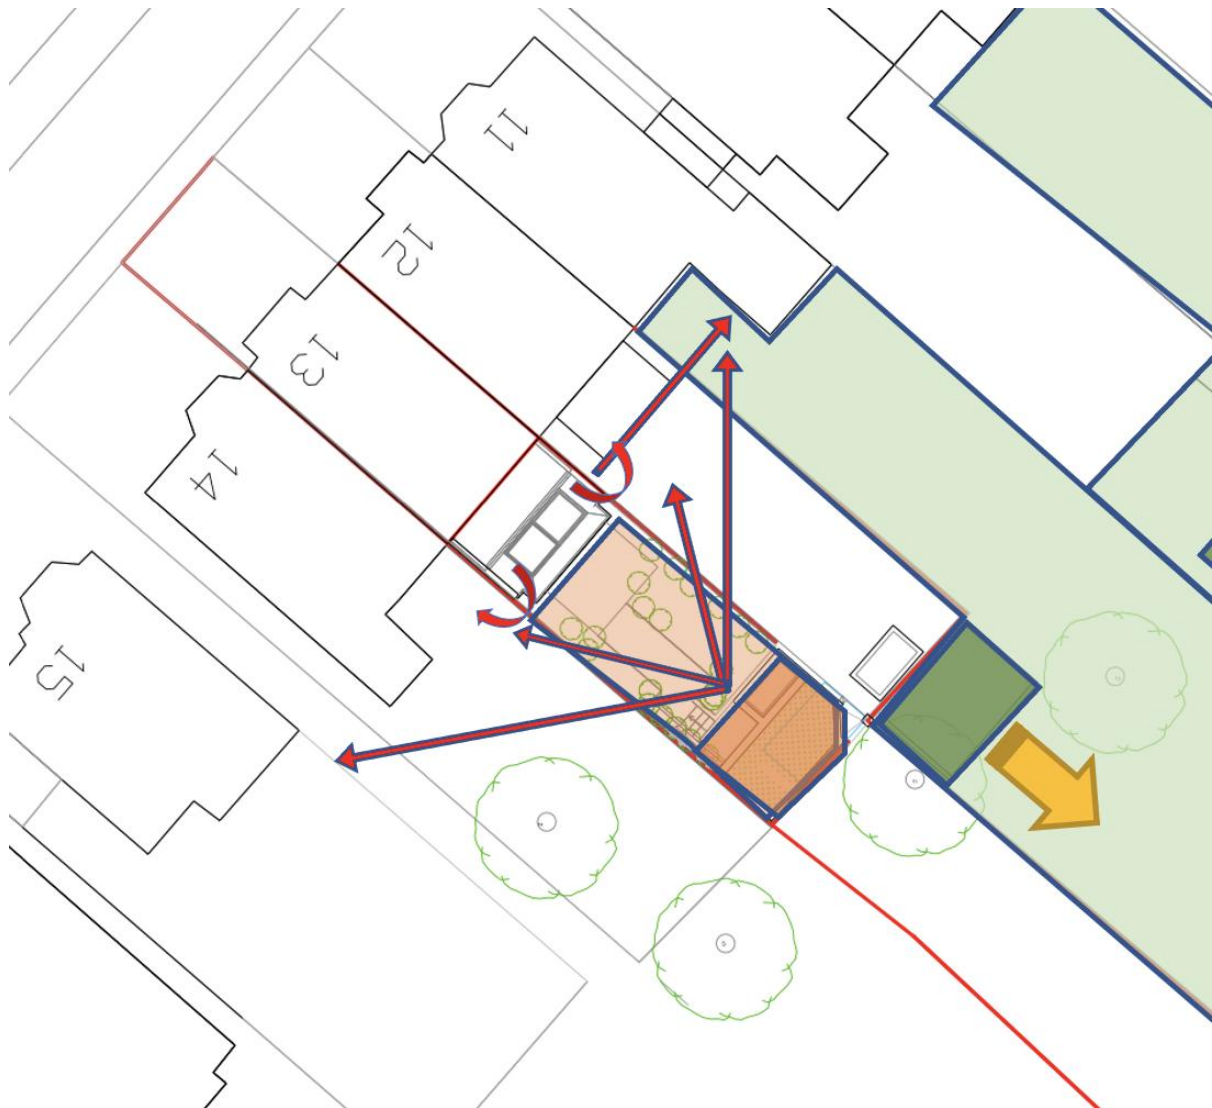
Overlook of garden building and agreed roof terrace on neighbouring residences
